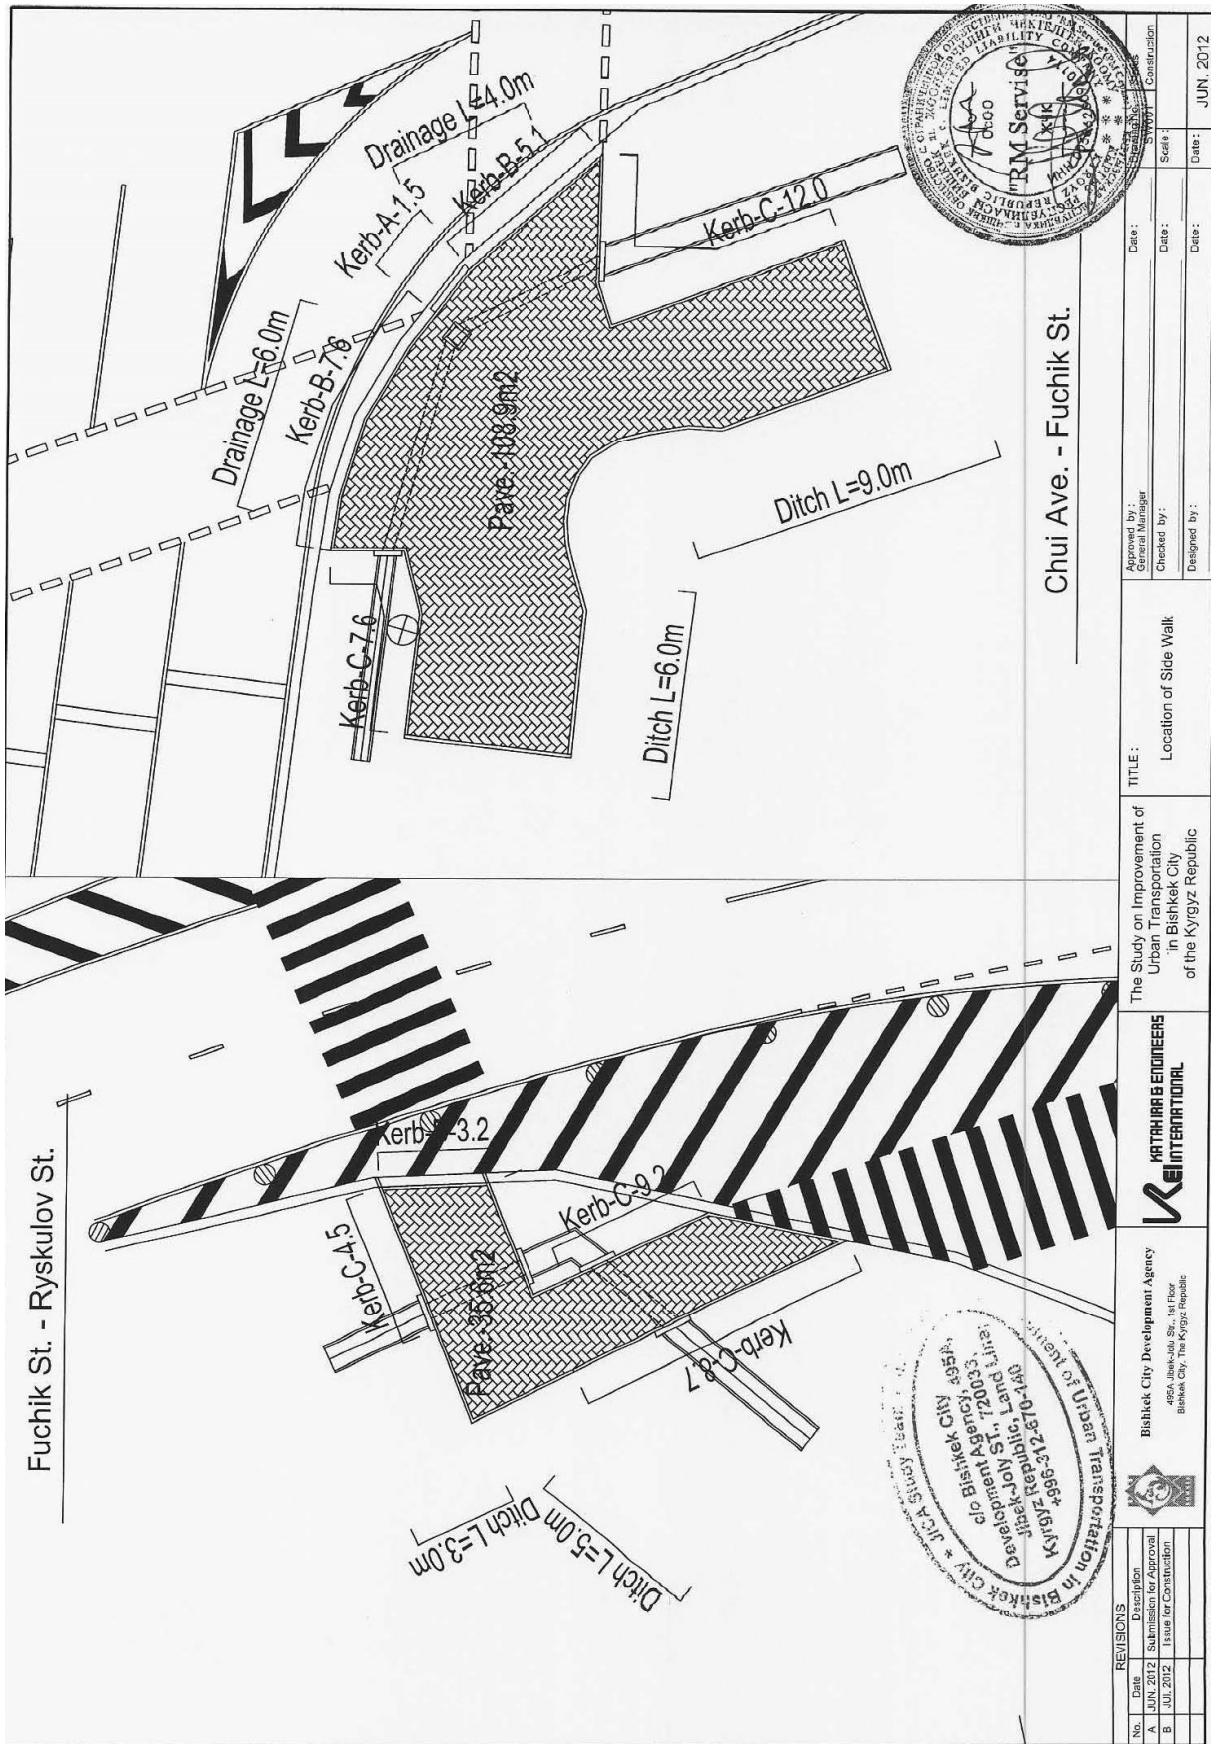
Approval Drawing of Sidewalk
